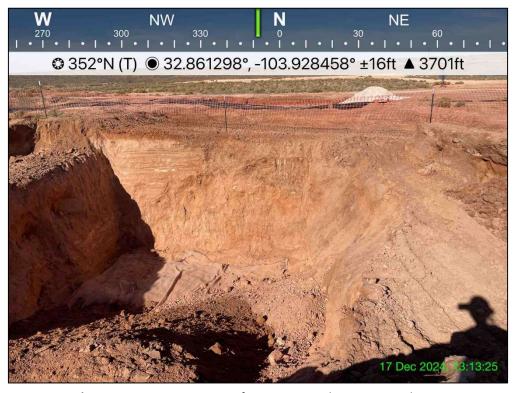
Excavation overview, facing west-north FL06@20 and SW15
